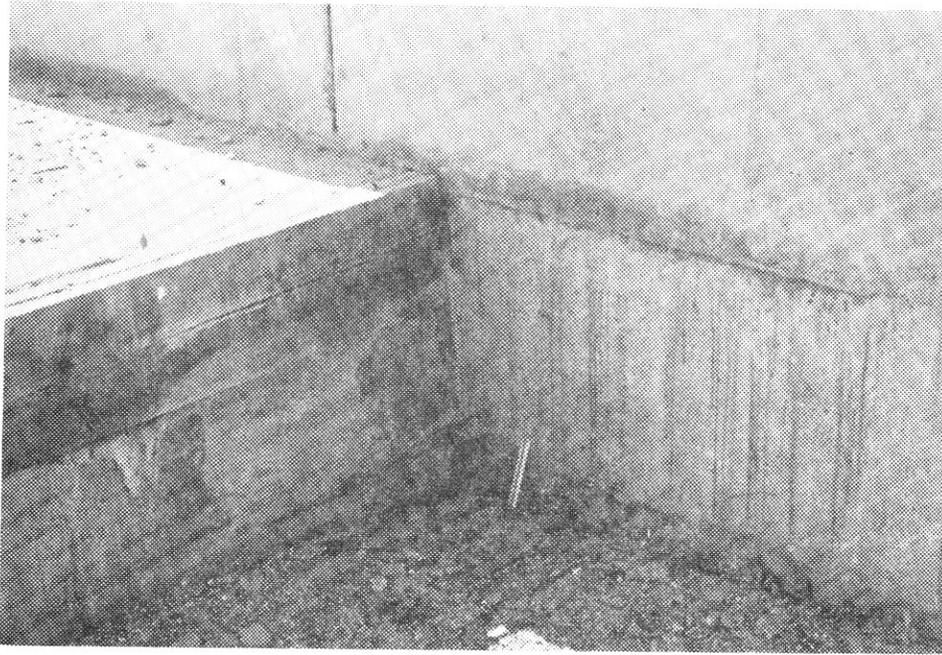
Abutment backfill settlement, north end of Roxford Street Undercrossing.
